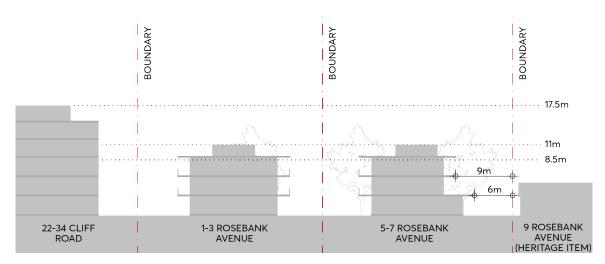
Setback controls for 5-7 Rosebank Avenue
